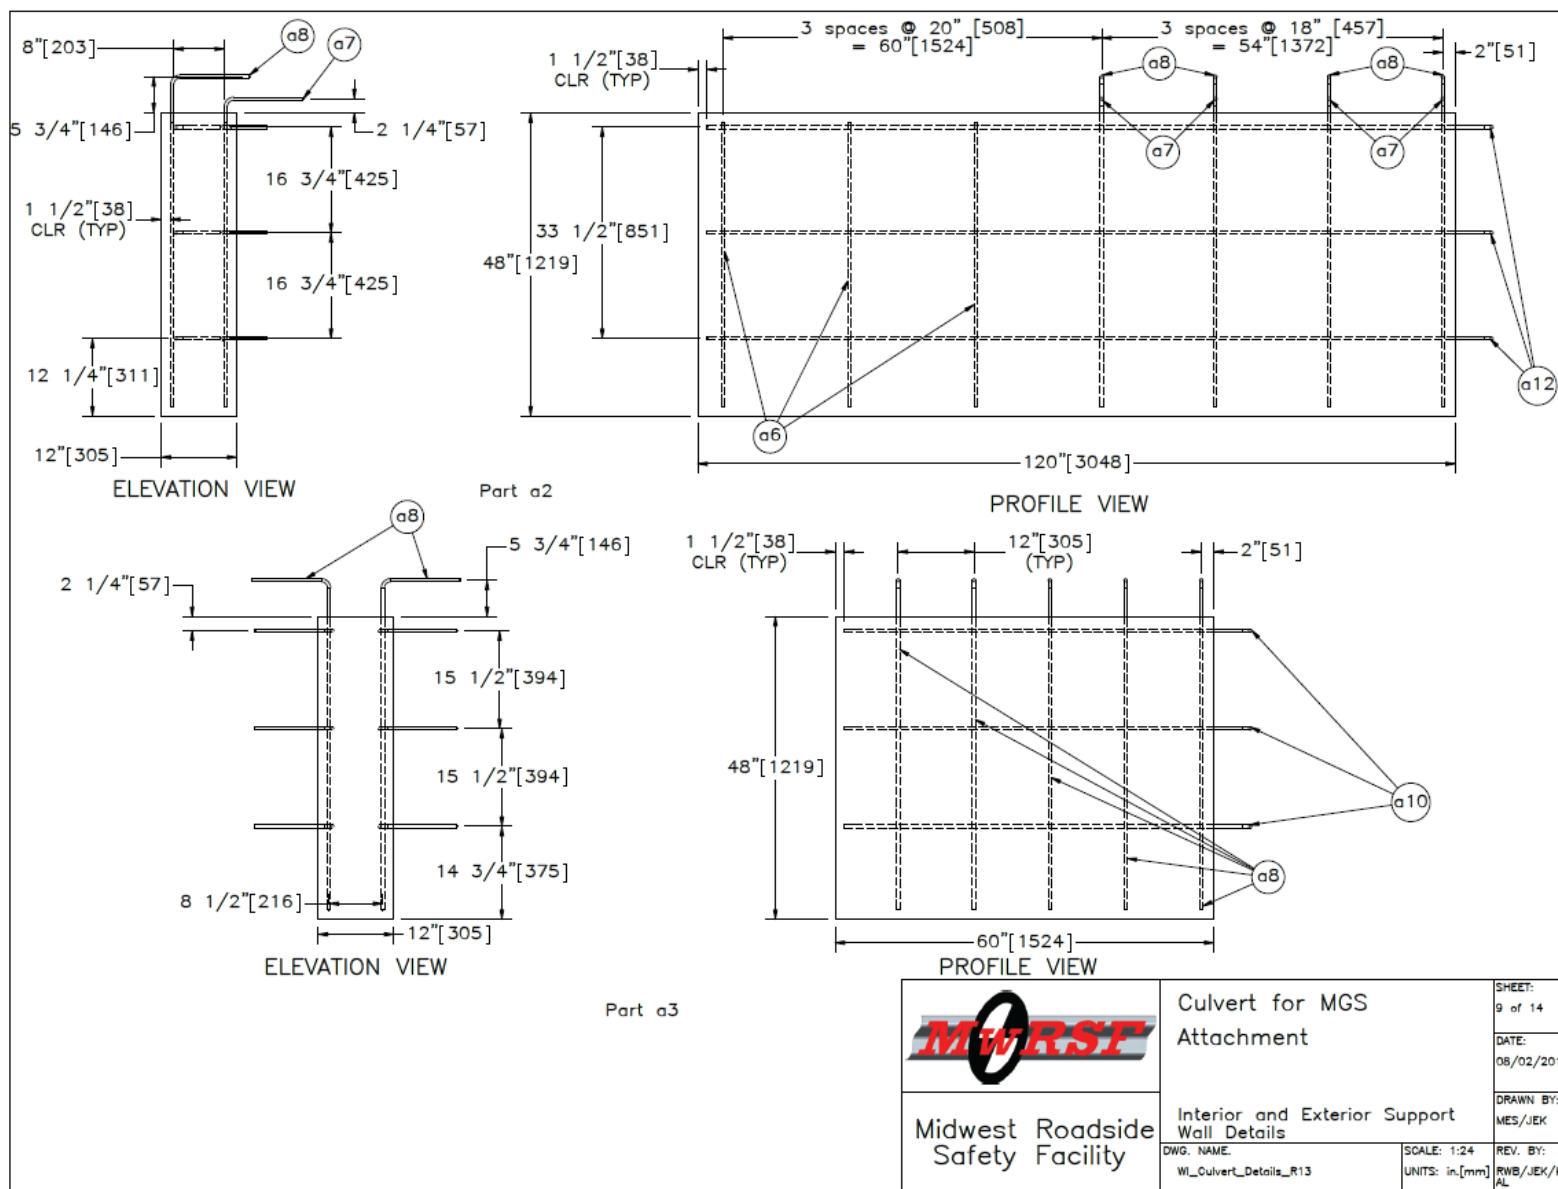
Interior and Exterior Support Wall Details, Test Nos. CMGS-1 and CMGS-2
